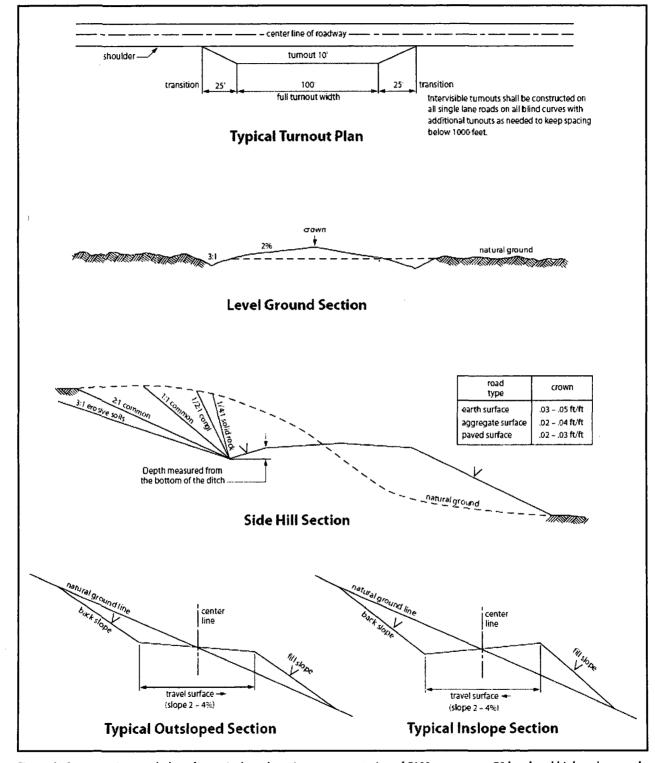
Cross-sections and plans for typical road sections representative of BLM resource or FS local and higher-class roads.
